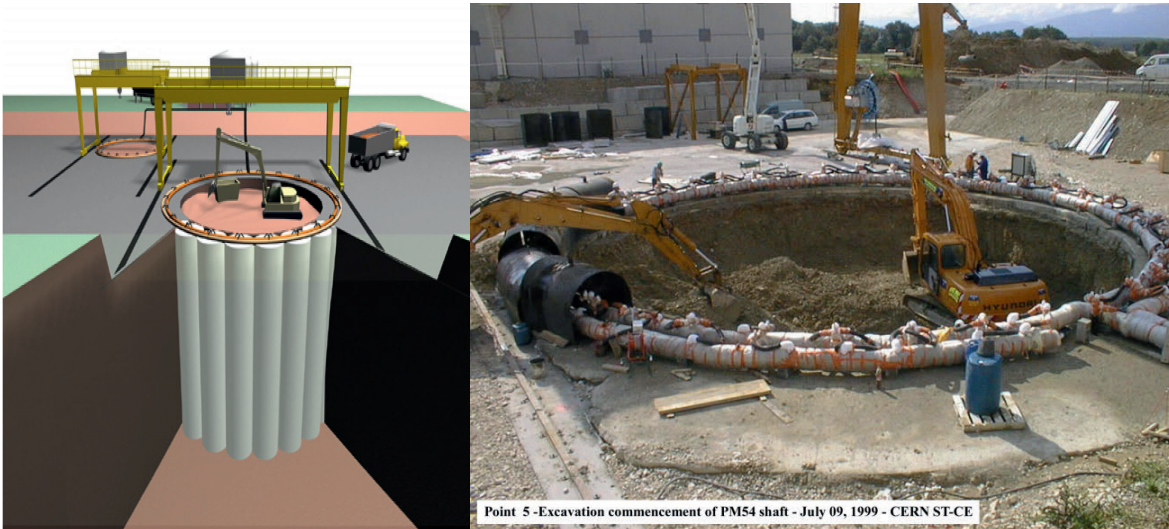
Linking up cylinders of ice to construct a temporary wall.
